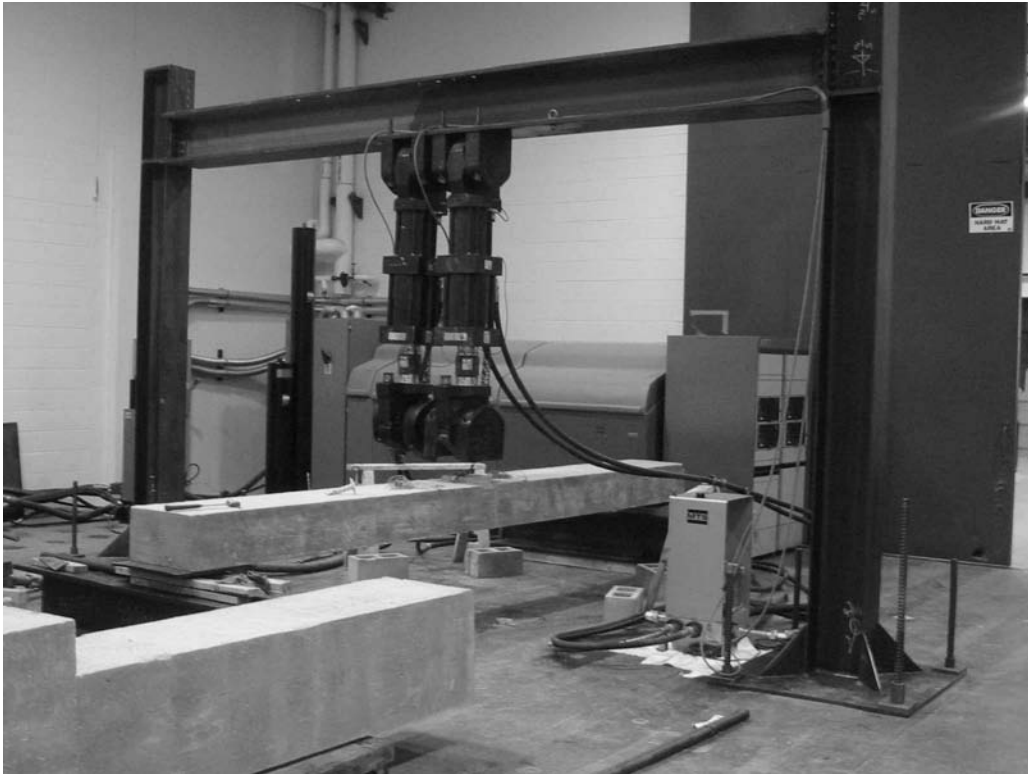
Center load reaction frame (Axial load frame not shown)
